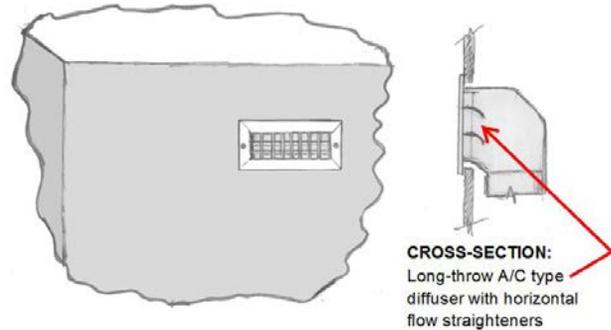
Interior High Wall Supply Outlet, shown with a Rectangular Diffuser
